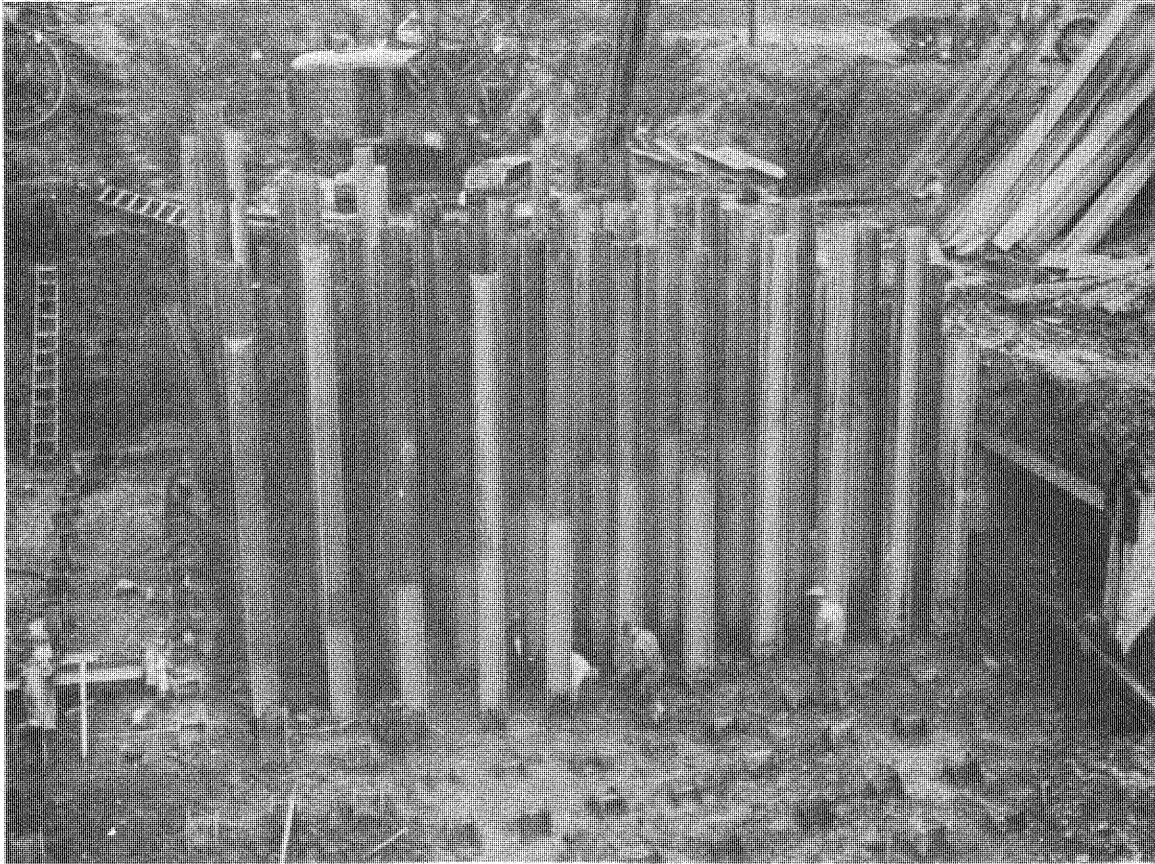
A portion of piling for powerplant foundation. Piles at left have been cut off to grade prior to capping. P783-908-1441, August 13, 1953.
